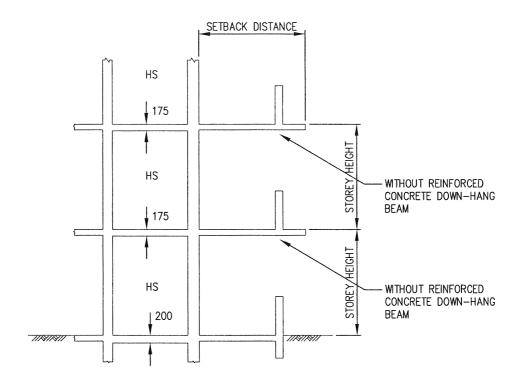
(a) REQUIREMENT ON SETBACK DISTANCE OF HS WALLS (WITHOUT DOWN-HANG BEAM)
